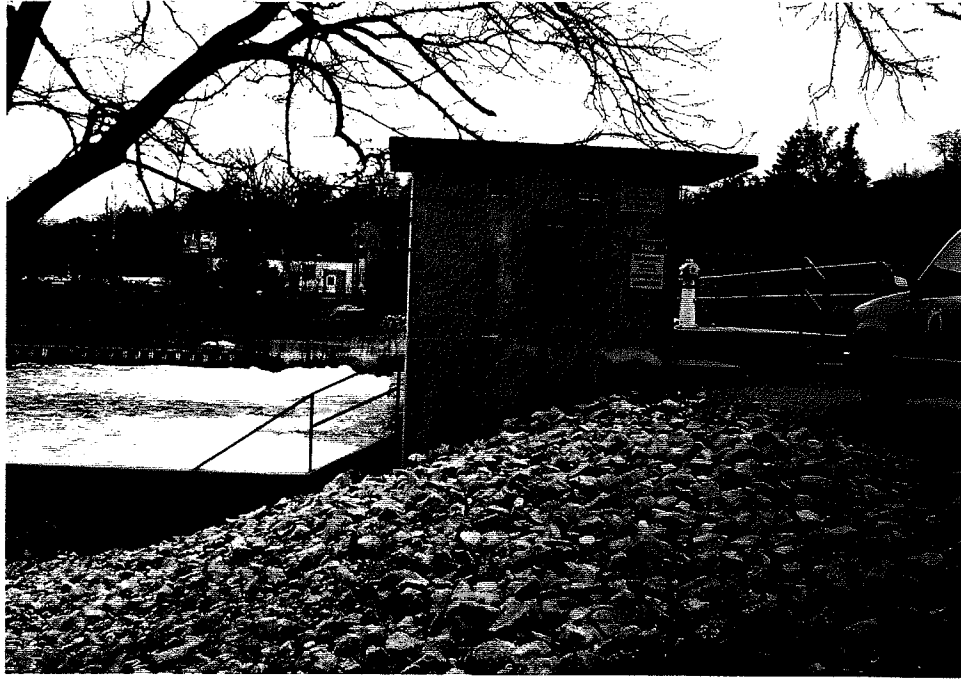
Control house structure. Rip-rap along downstream face of left embankment. Nov. '92
